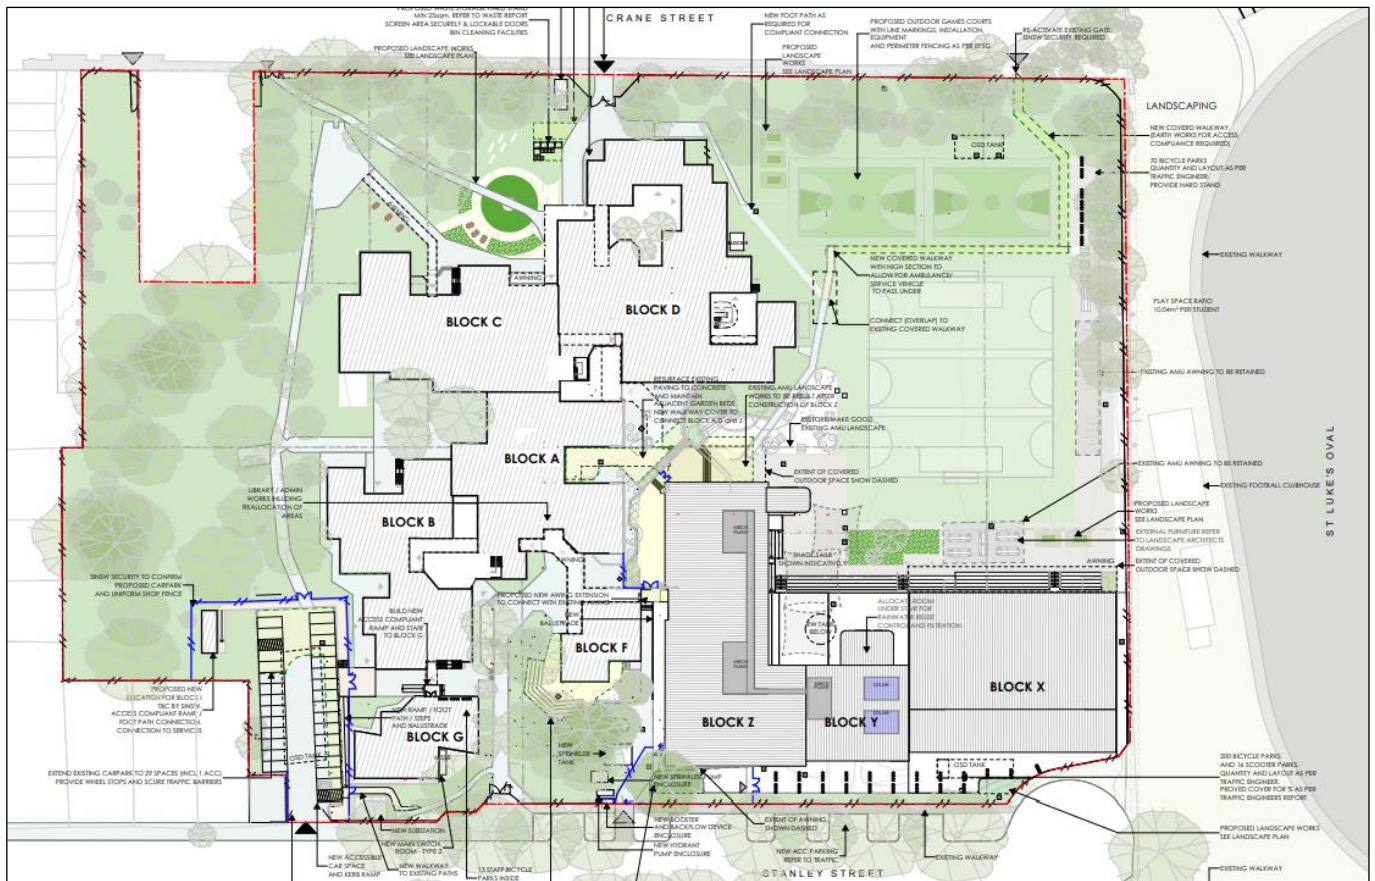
Extract from Site Plan (Source: JDH Architects, 2023)
